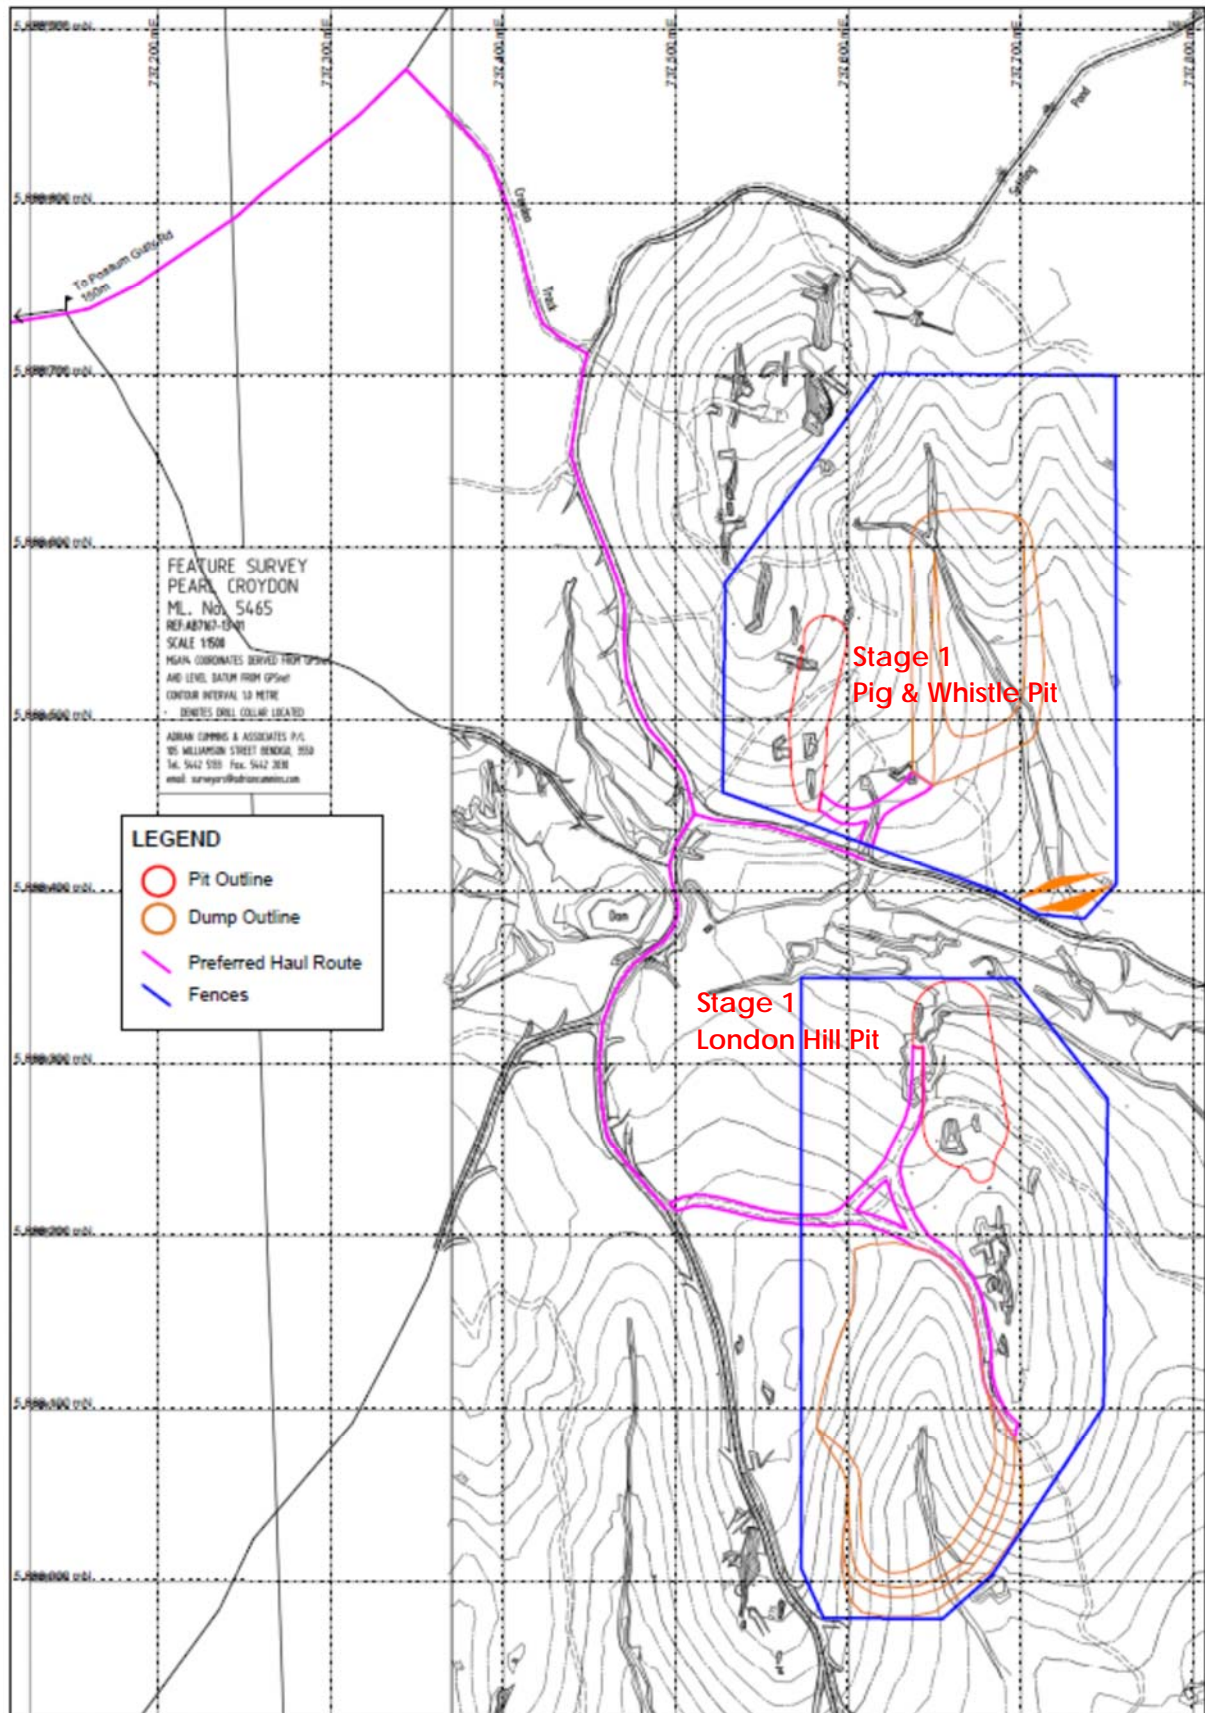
Pearl Croydon Stage 1 open pit mine site layout
